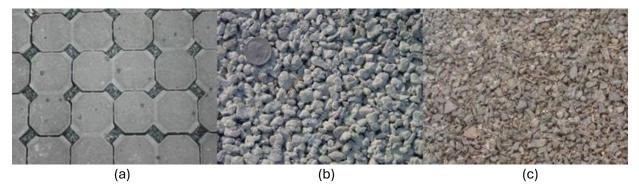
Common Pervious Pavement Materials: a) Permeable Interlocking Concrete Pavers, (b) Porous Concrete, (c) Flexi-pave[™].
